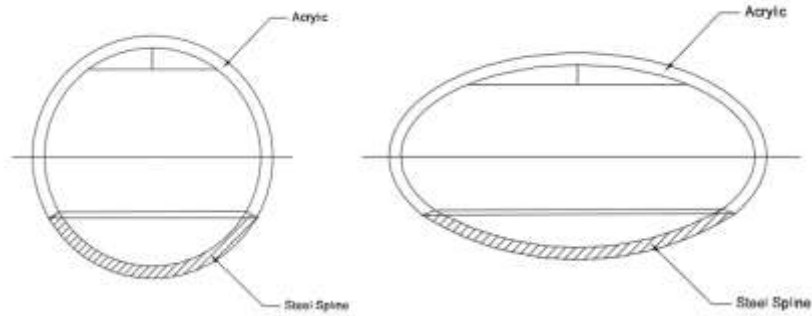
Use of acrylic-steel combination for tunnel cross-section
